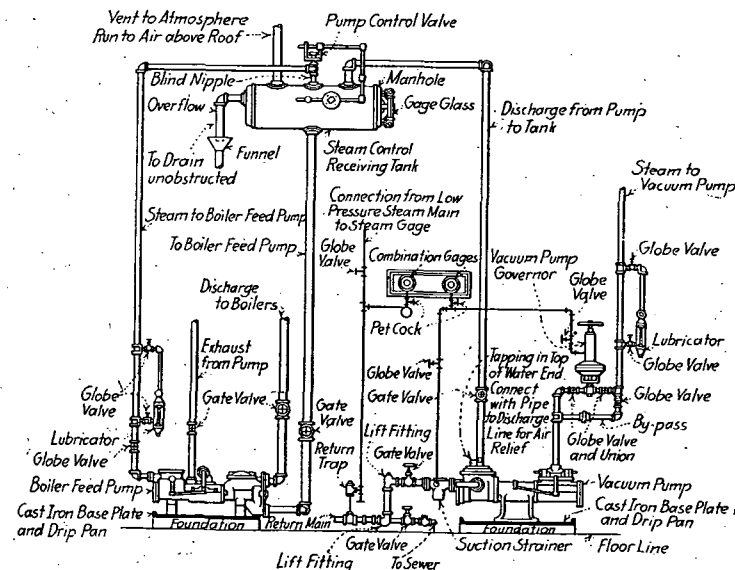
METHOD OF CONNECTING VACUUM PUMP, BOILER-FEED PUMP AND STEAM-CONTROL RECEIVING TANK
